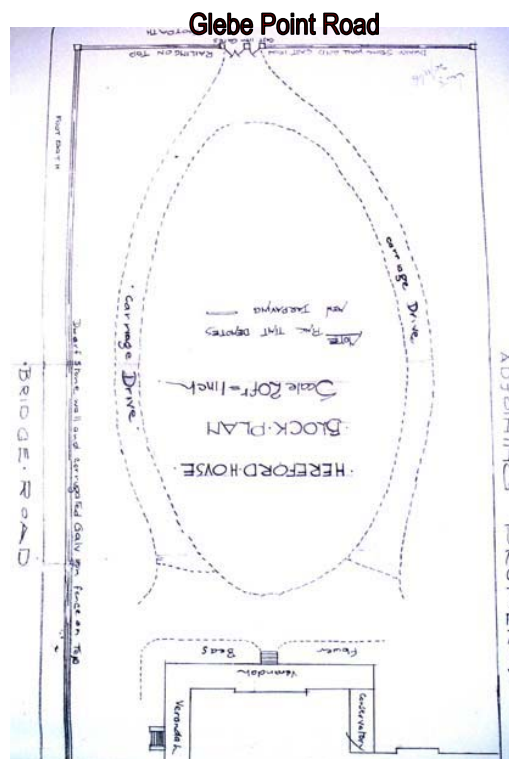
Undated plan from the State Archives files on *Hereford House* showing the carriage drive which extended through the northern portions of the site from Glebe Point Road.
